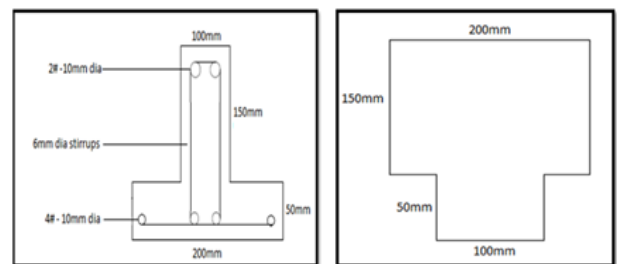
Dimension of Beam (Left) and Block (Right)
